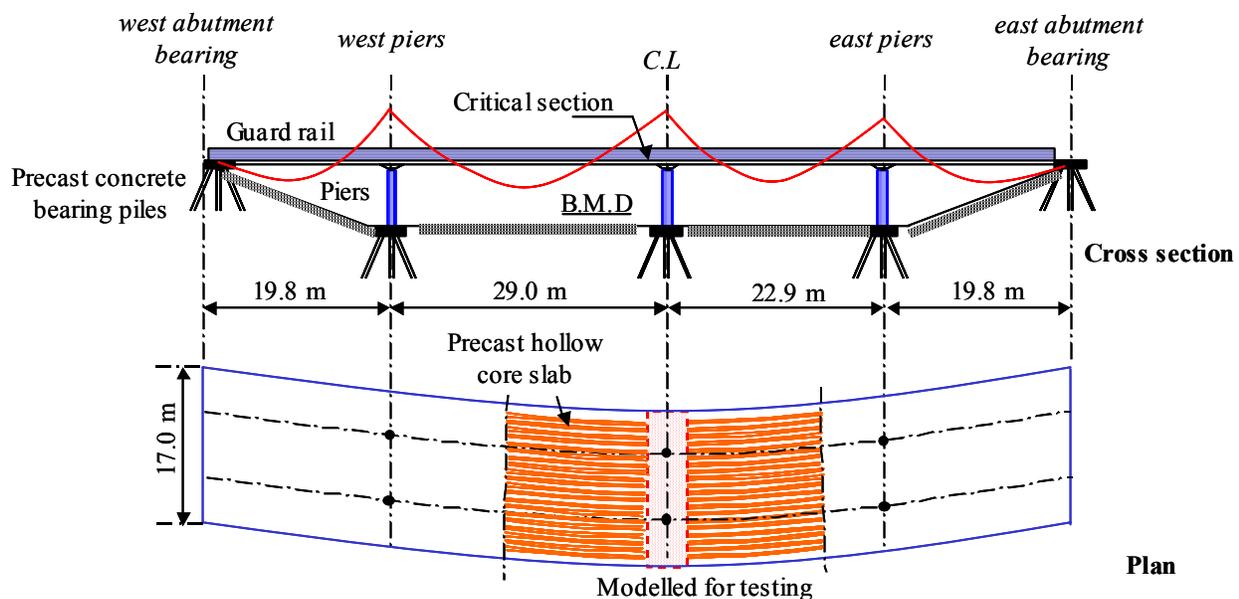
Schematic of bridge No. 444 in Winnipeg - Manitoba - Canada
